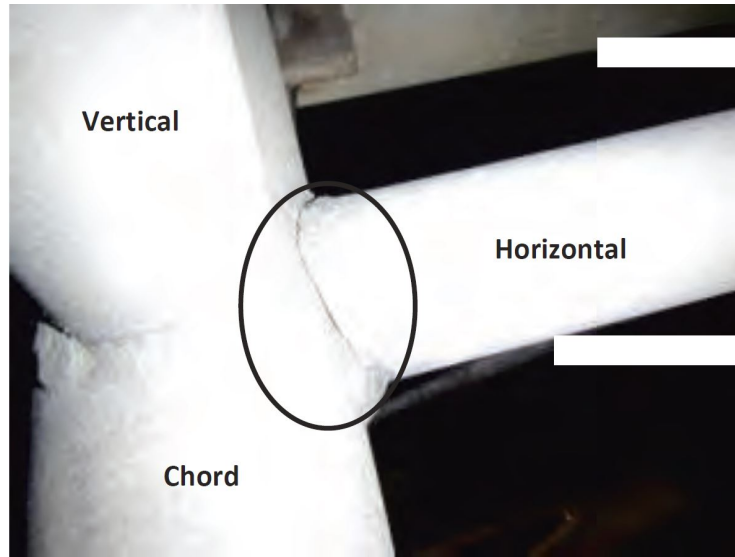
Photo. Cracked weld on a horizontal truss.
